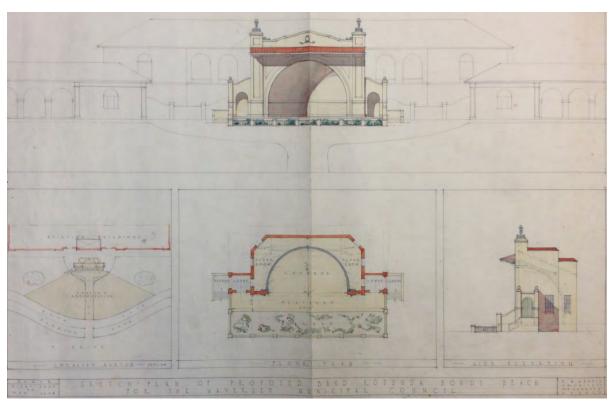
Sketch Plan of Proposed Band Rotunda, C B Arnold. Source: WLS. JRA photograph of original
